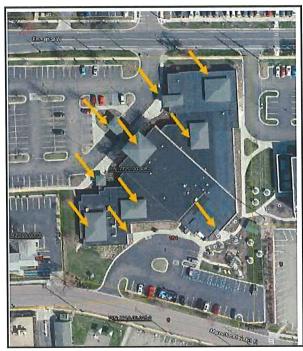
Arrows point to ten roof sections that will be replaced with metal sheets under the subject proposal. Aerial photograph provided by City of Battle Creek, dated April 2020 (approx.).
